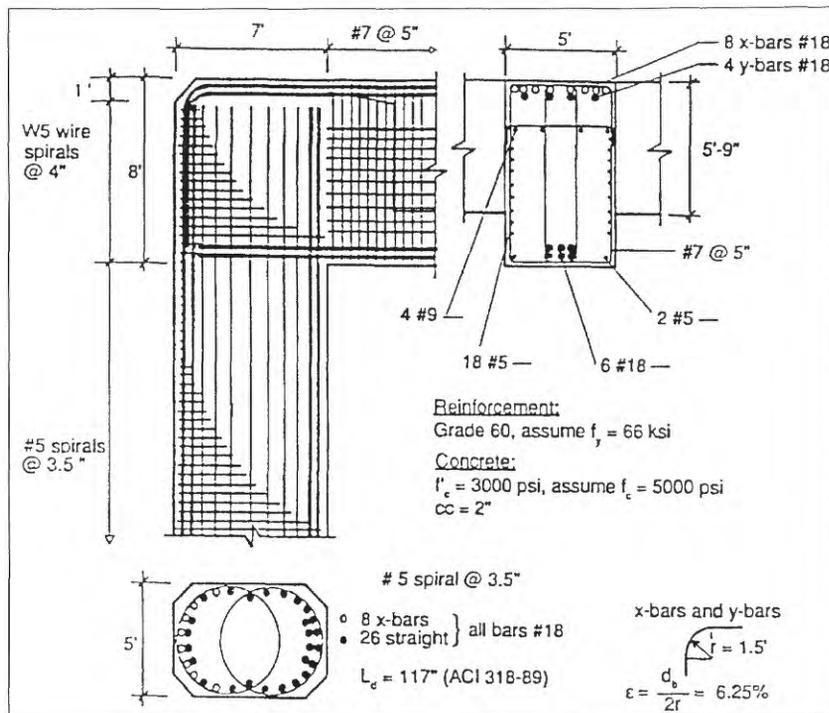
Drawing of knee joint reinforcement for Bent 38 of Route 980 Southbound Connector.
